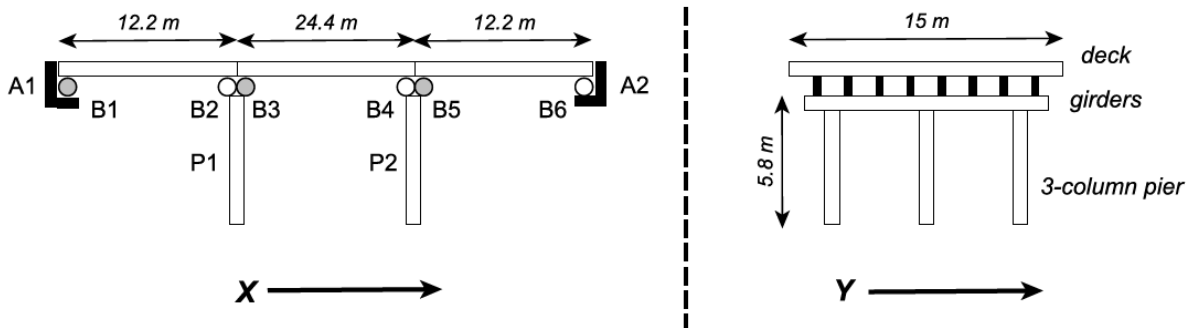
Bridge layout in longitudinal (left) and in transversal (right) directions
